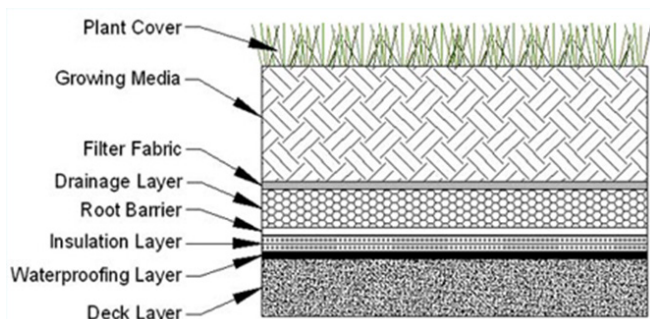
This image shows the different layers of a green roof that support plant growth and retain water for plant uptake while preventing ponding on the roof surface. (DOEE)
